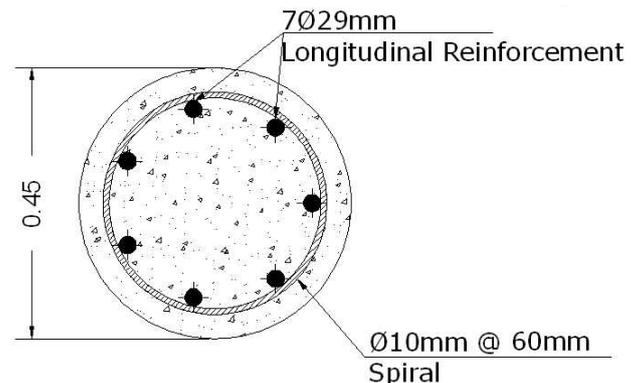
Final design section for the column of Example 9.3-2.
